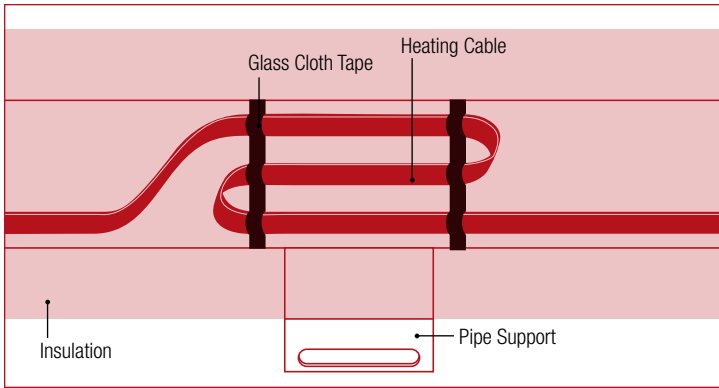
Securing Heating Cable to Pipe Supports
